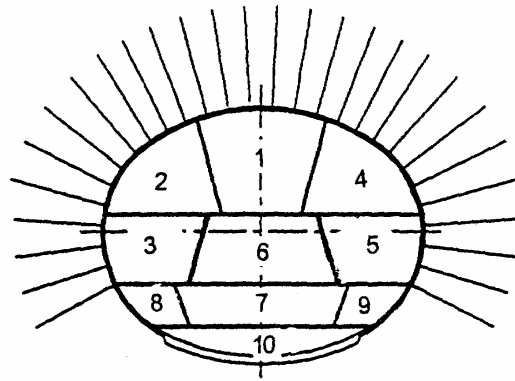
Top heading and bench method of excavation. Temporary support consists of a 200 mm thick shotcrete shell with 4 and 6 m long untensioned grouted rockbolts at 1.0 - 1.5 m spacing
